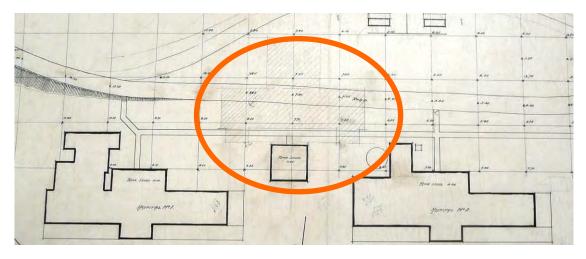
Quarantine Station Point Nepean. Block Plan showing Levels of Site (detail). Dated 26 October 1914. The circle indicates the outline of the subject building. Source: National Archives of Australia.
